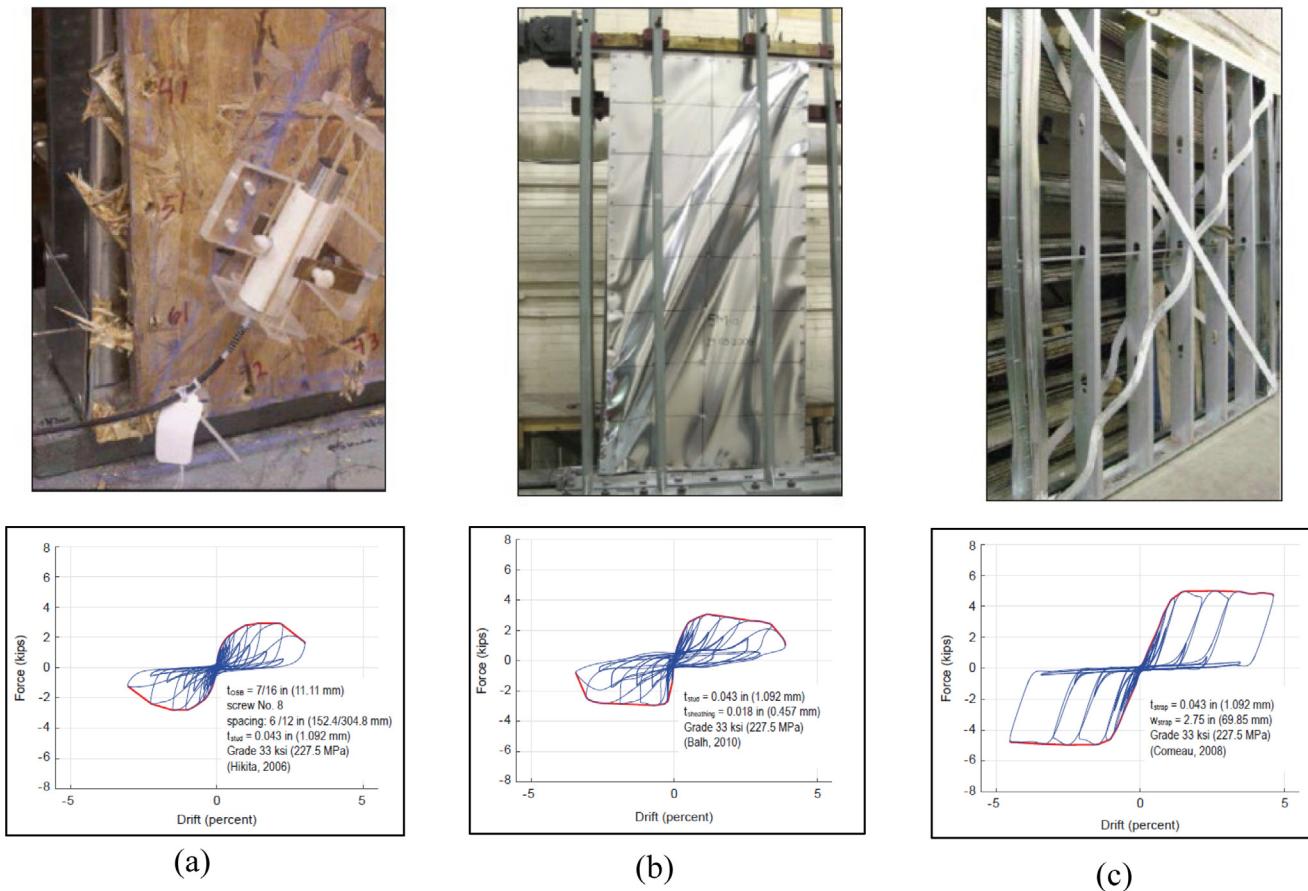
Failure modes and hysteresis behaviour of (a) OSB-sheathed walls, (b) steel-sheathed walls, and (c) strap-braced walls [5].
